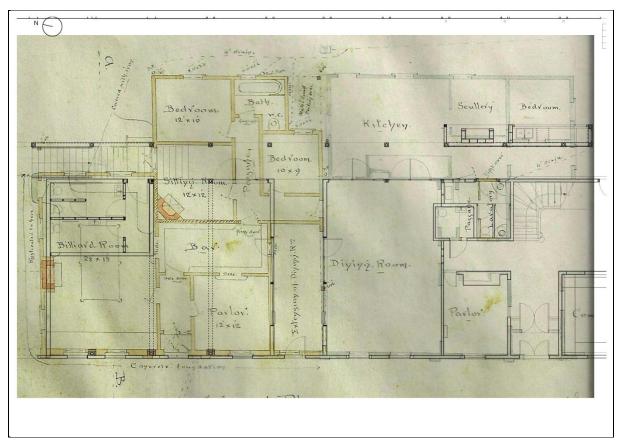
Plan of the rebuilt structure overlaid onto the original plans of the Messenger extension
